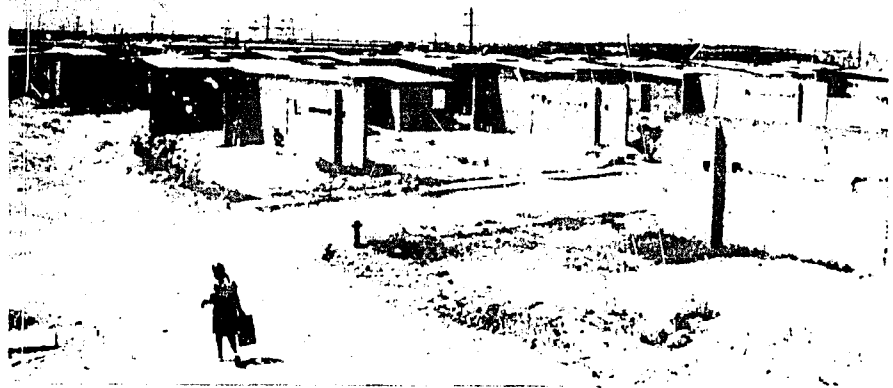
& b - Construction of houses, using prefabricated sides, at Seaview Gardens.
